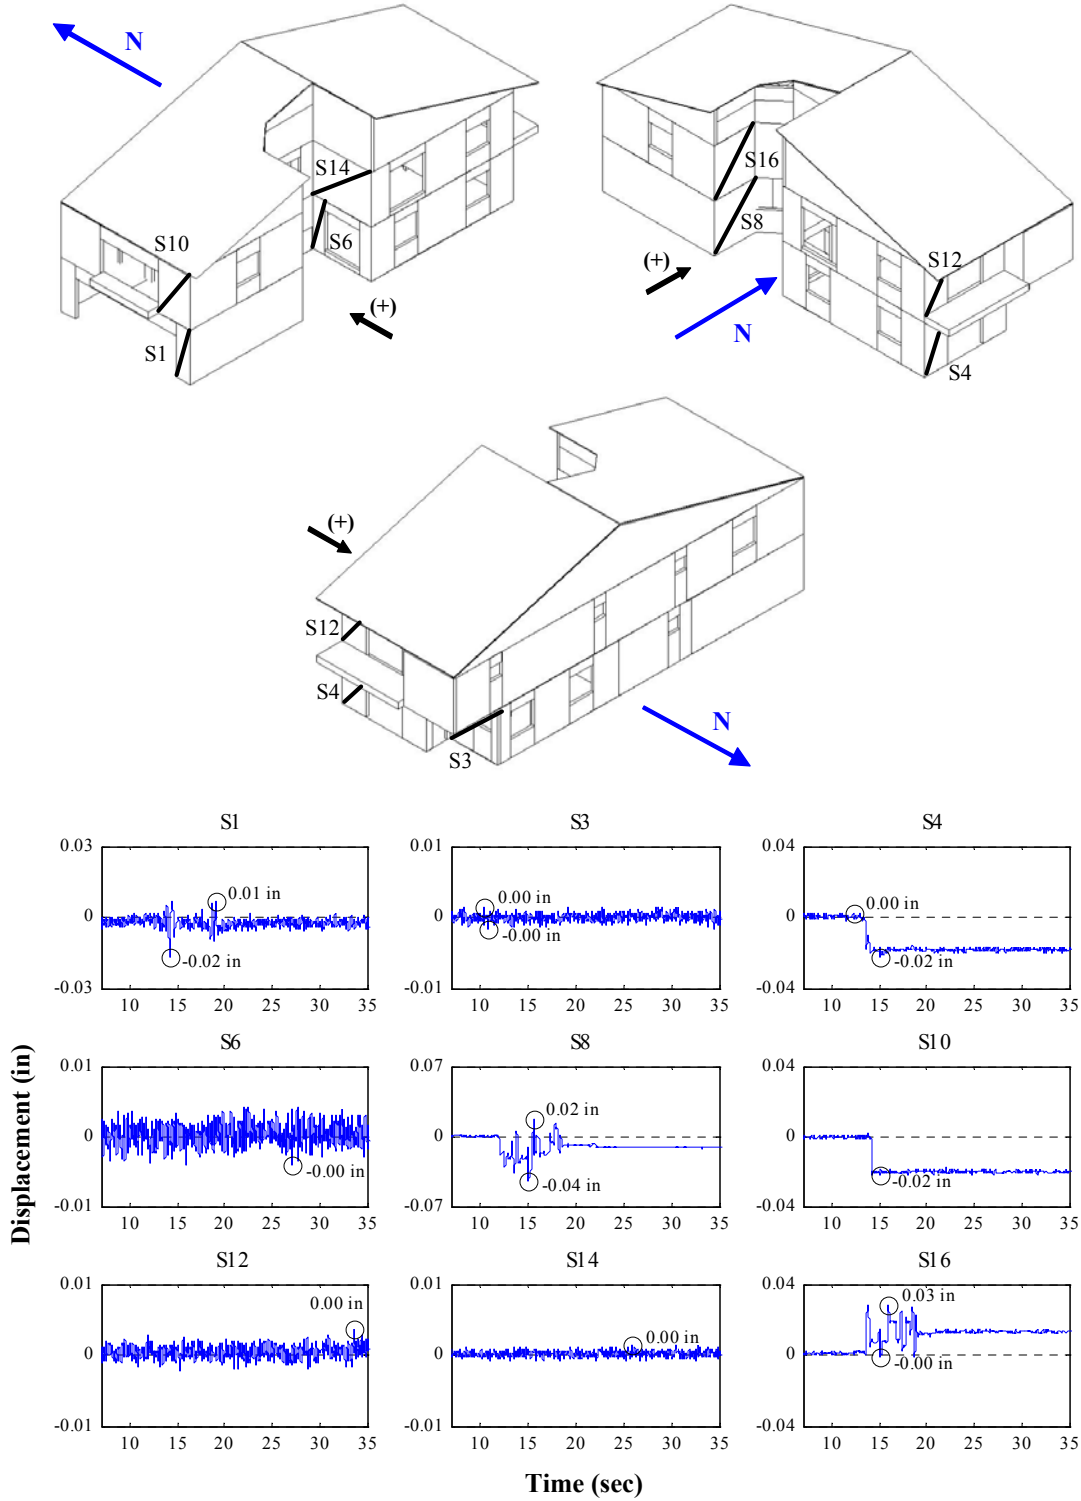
Wall deformations of north-south external walls for Test NWP2S09
